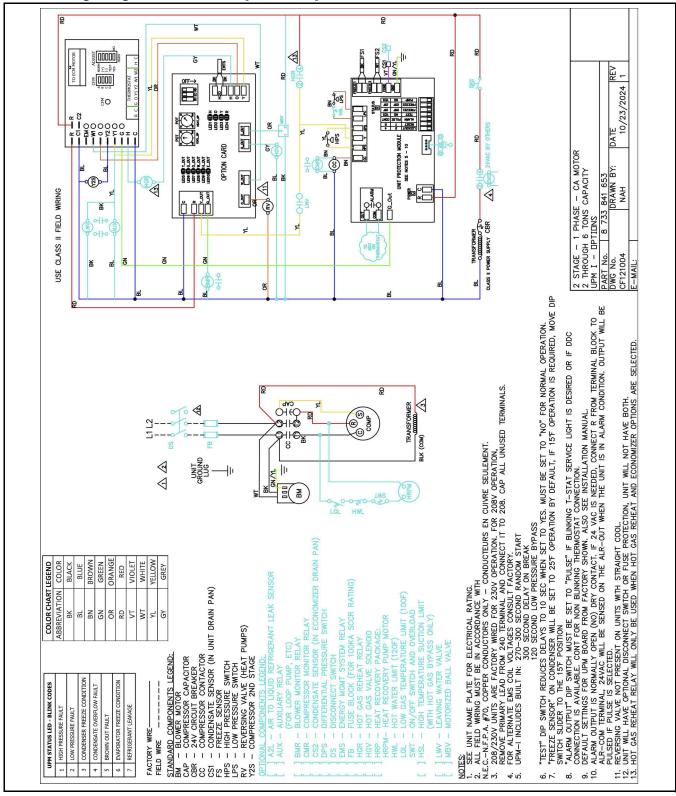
Two-Stage, Single-Phase Unit with Optional Components and CA Motor
